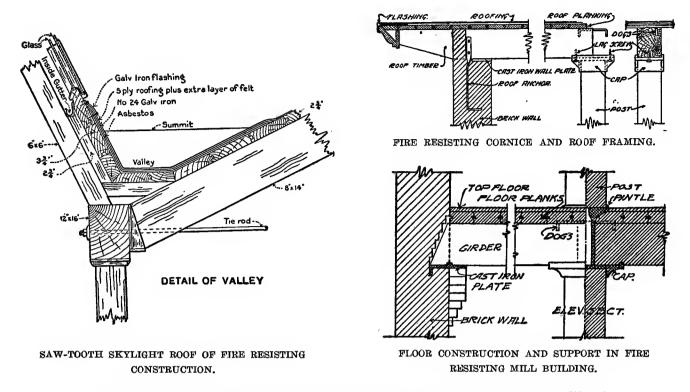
B-FIRE RESISTING TIMBER FACTORY CONSTRUCTION
